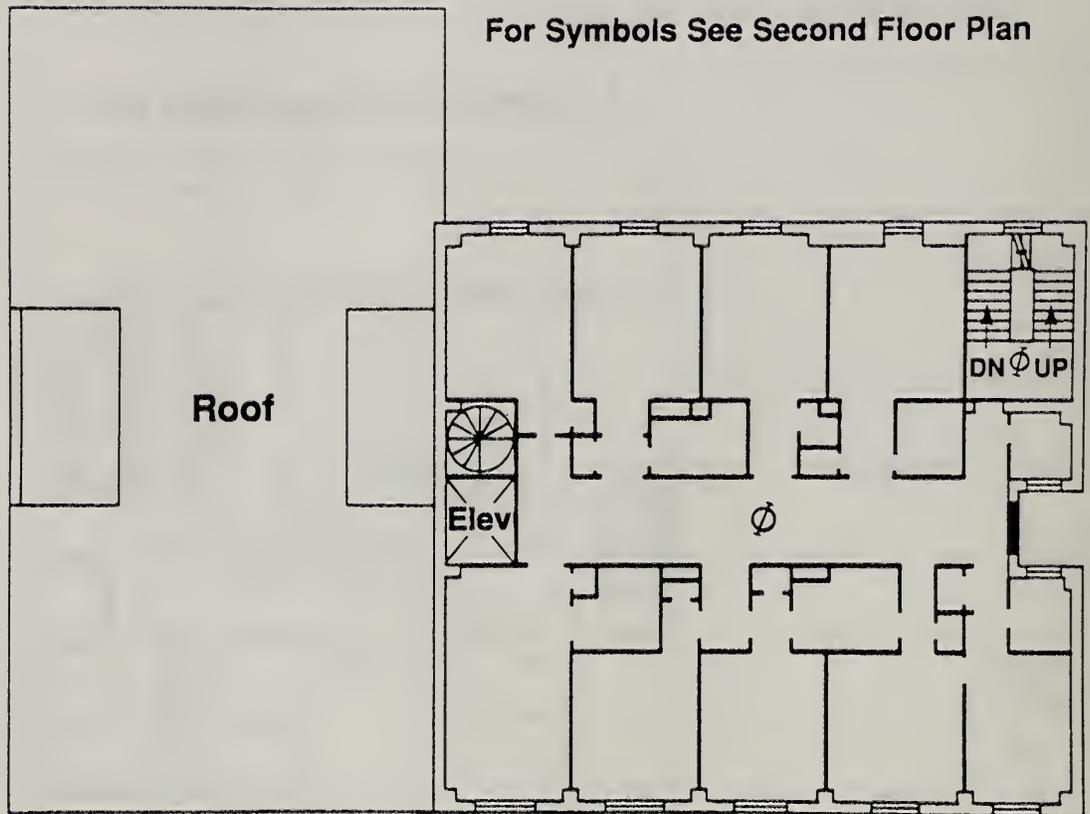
Typical Plan for the fifth and sixth floors Plaza Hotel
